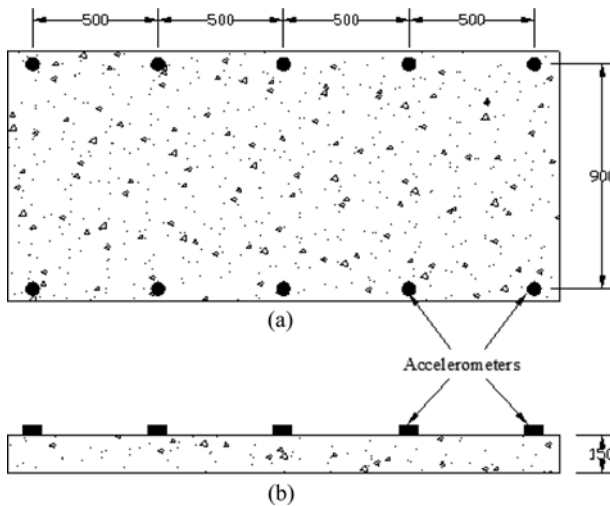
Position of the Accelerometers and the Shaker on the Slab: (a) Plan, (b) Elevation (unit in mm)
